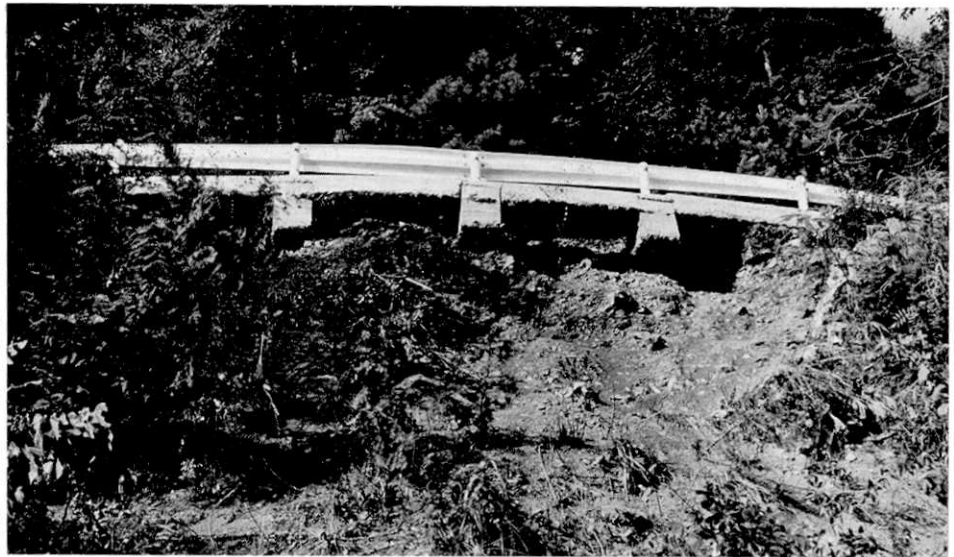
The pavement slab hanging in the air due to the slide and failure of the roadbed. (Prefectural road, from Hachiman to Kanayama, Horigoshi mountain pass)
